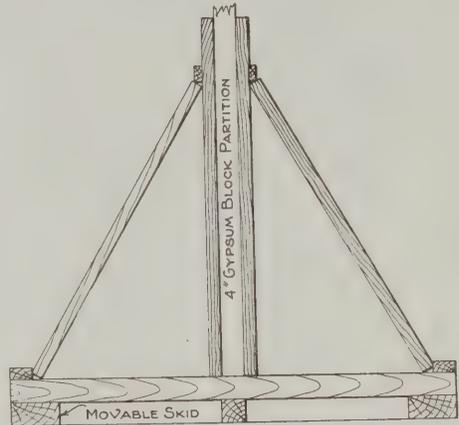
Vertical Cross Section of Bracing Used to Move the Partitions—Scale $\frac{3}{8}$ In. to the Foot
